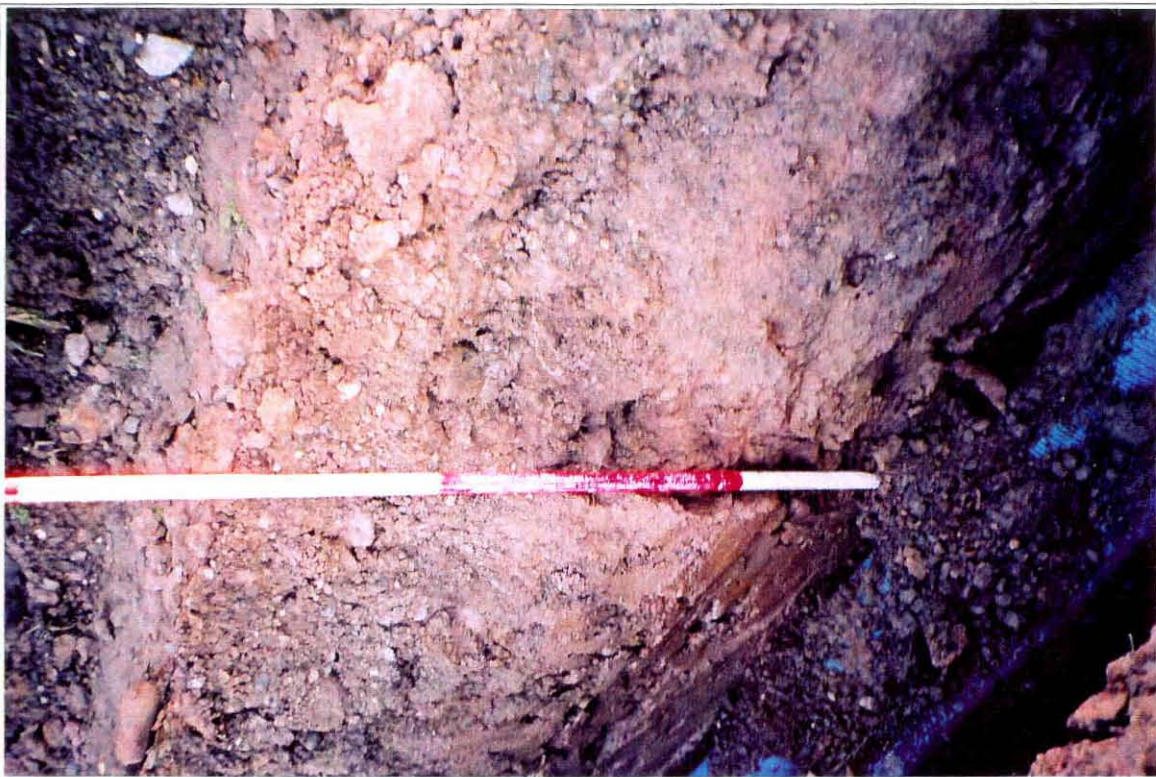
Pipe trench adjacent to PRN 81544 Pen-yr-Allt quarry I. Photo CPAT 1131.10
